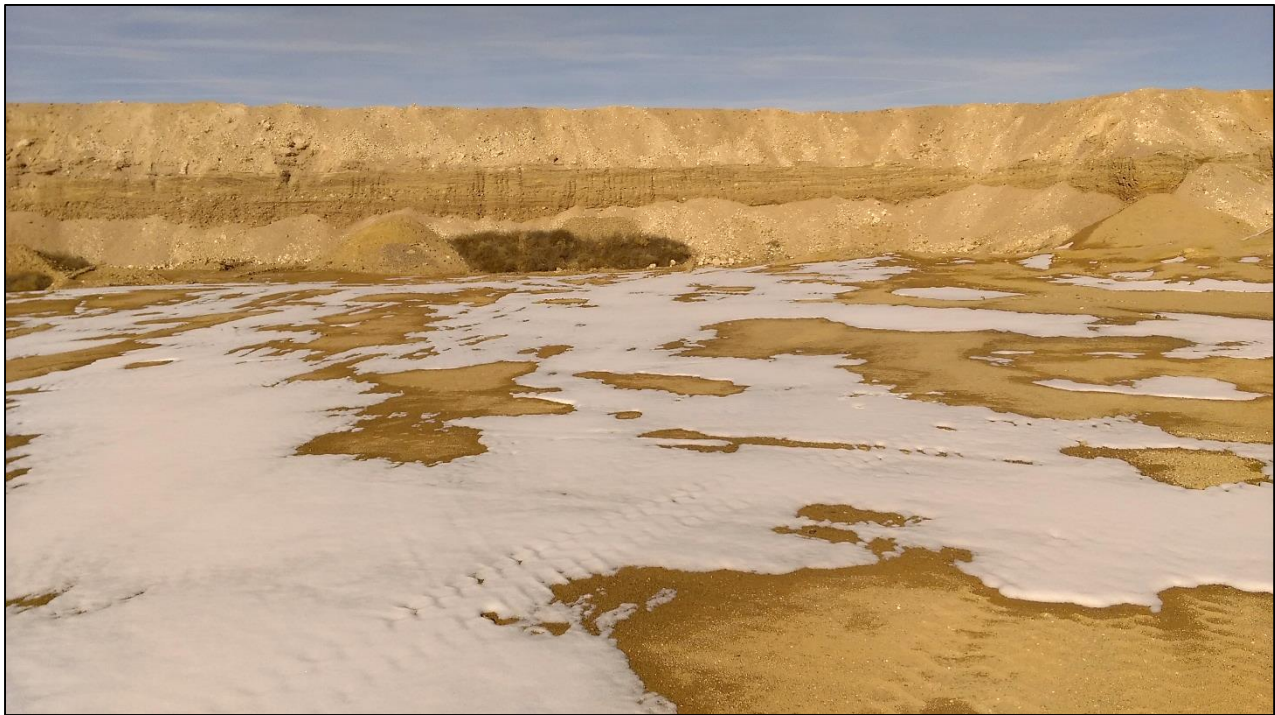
View looking north from pit floor, showing south-facing portion of mined wall in phase 1 mining area. Note mined wall approximately 20 feet in height with near vertical slope gradients.
